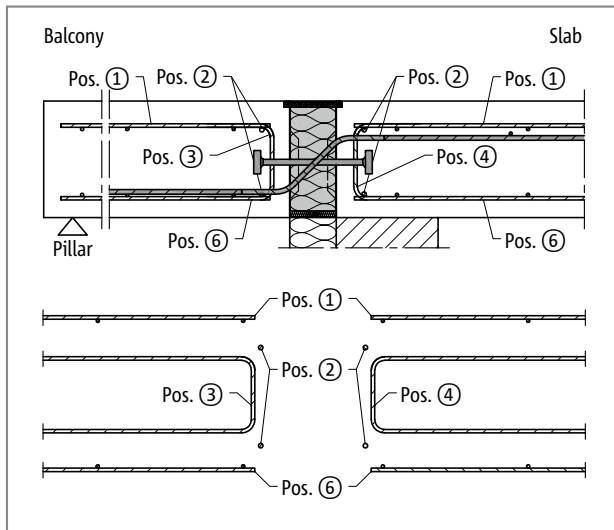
Schöck Isokorb® T type Q-P: On-site reinforcement
